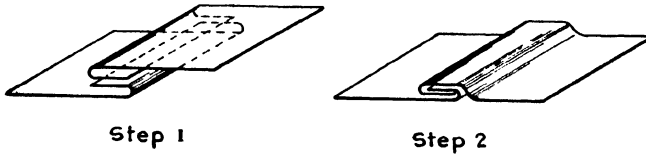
Flat Seam Roofing. (Courtesy Revere Copper and Brass, Inc.)
